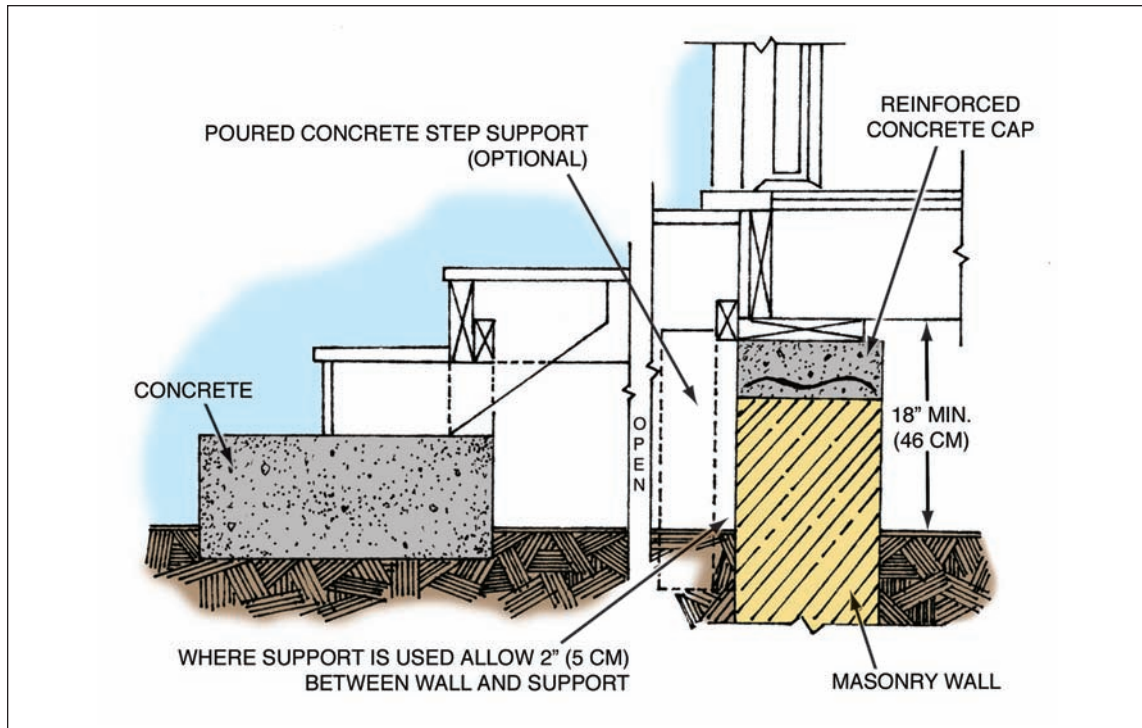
Construction of wooden steps to prevent hidden termite attack.
